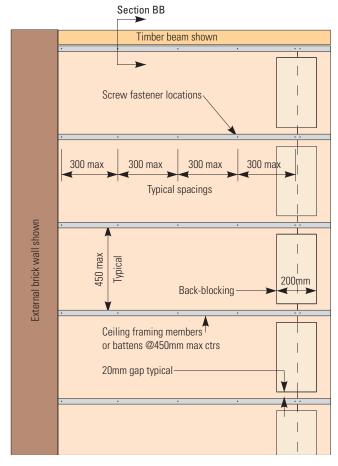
External Ceiling Fixing Layout (1200mm wide plasterboard sheets)
